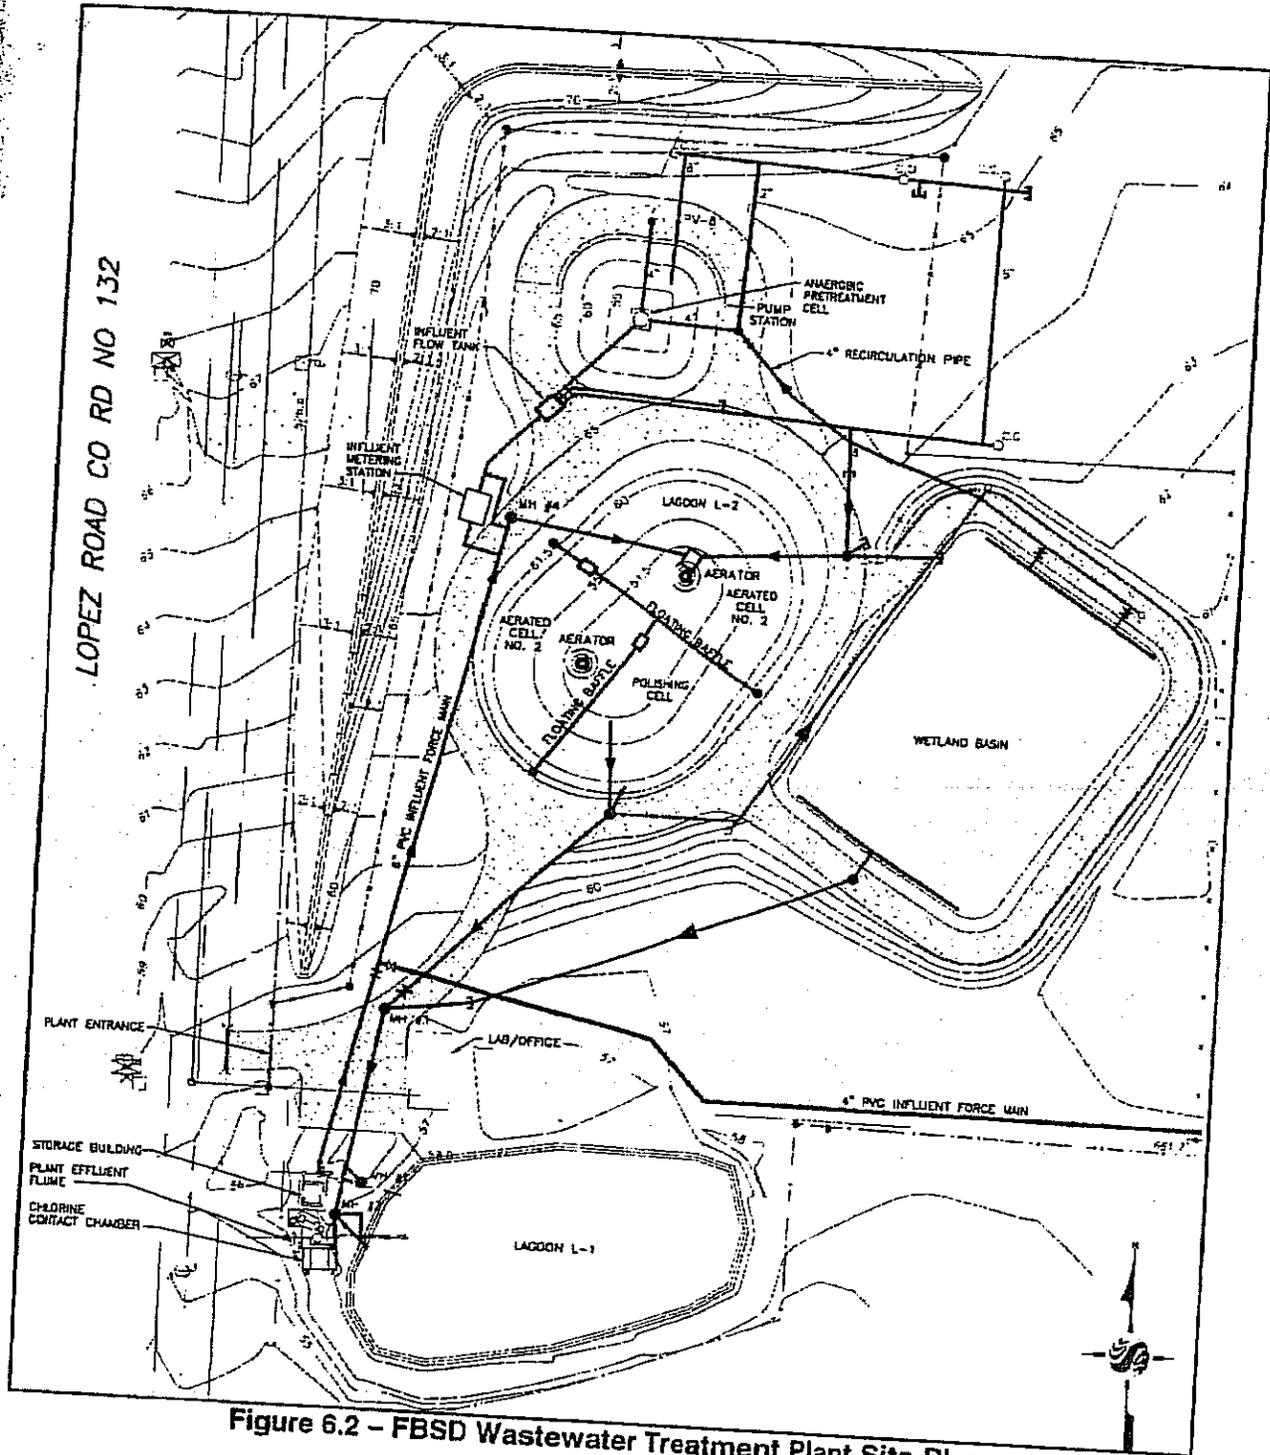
FBSD Wastewater Treatment Plant Site Plan
